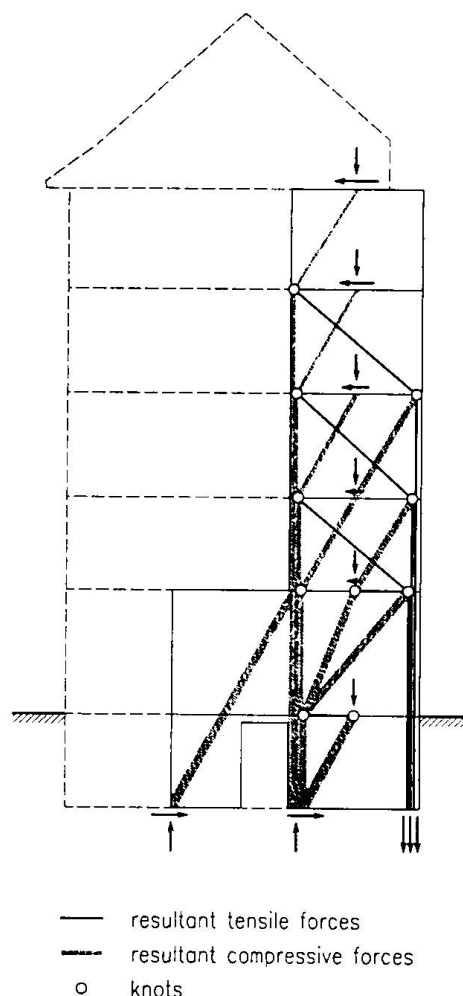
Stress-field of the CFRP-reinforced load bearing masonry wall
